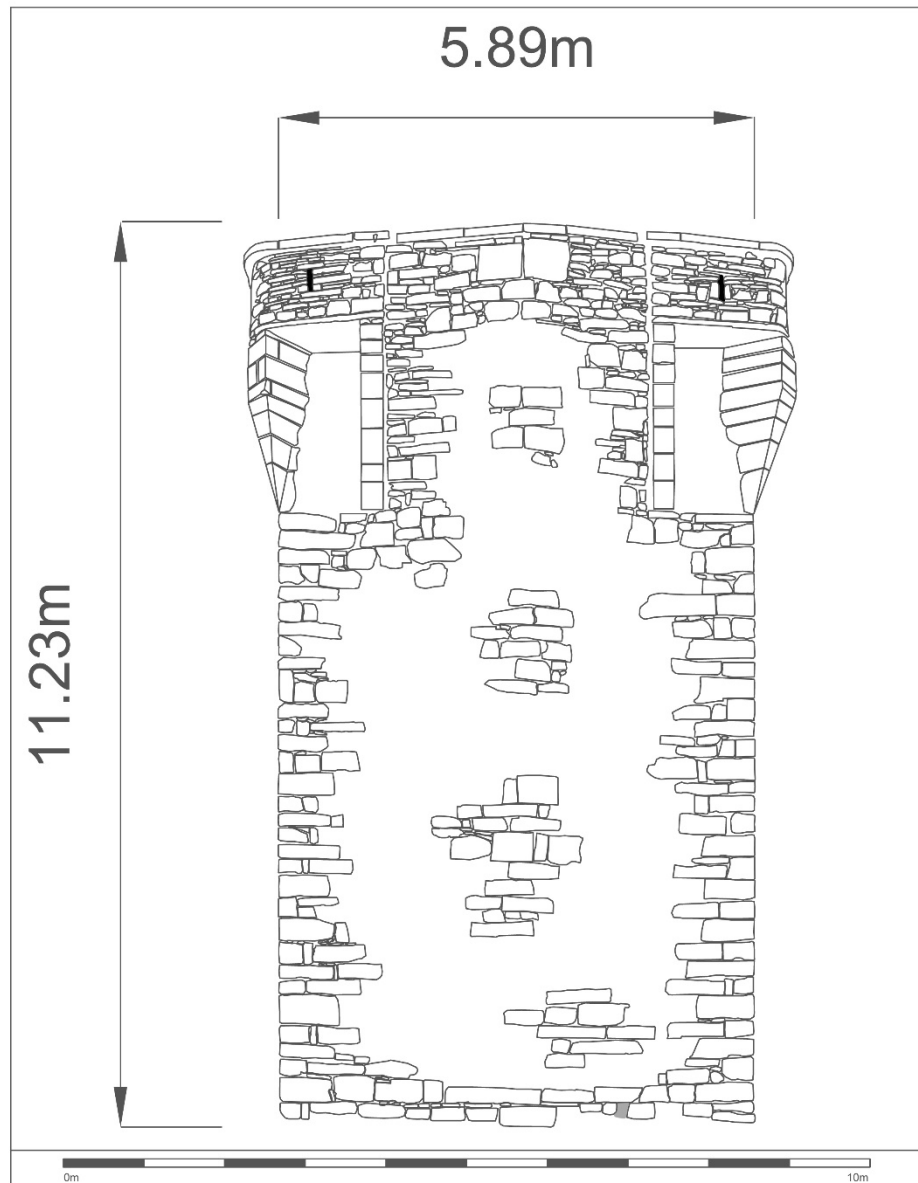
External elevation of the south wall of the signal tower at Carrowmably Signal Station. The chute at the base of the eastern side of the wall is shaded grey. The gun-loops on the southern sides of the south-west and south-east bartizans are shaded black.
